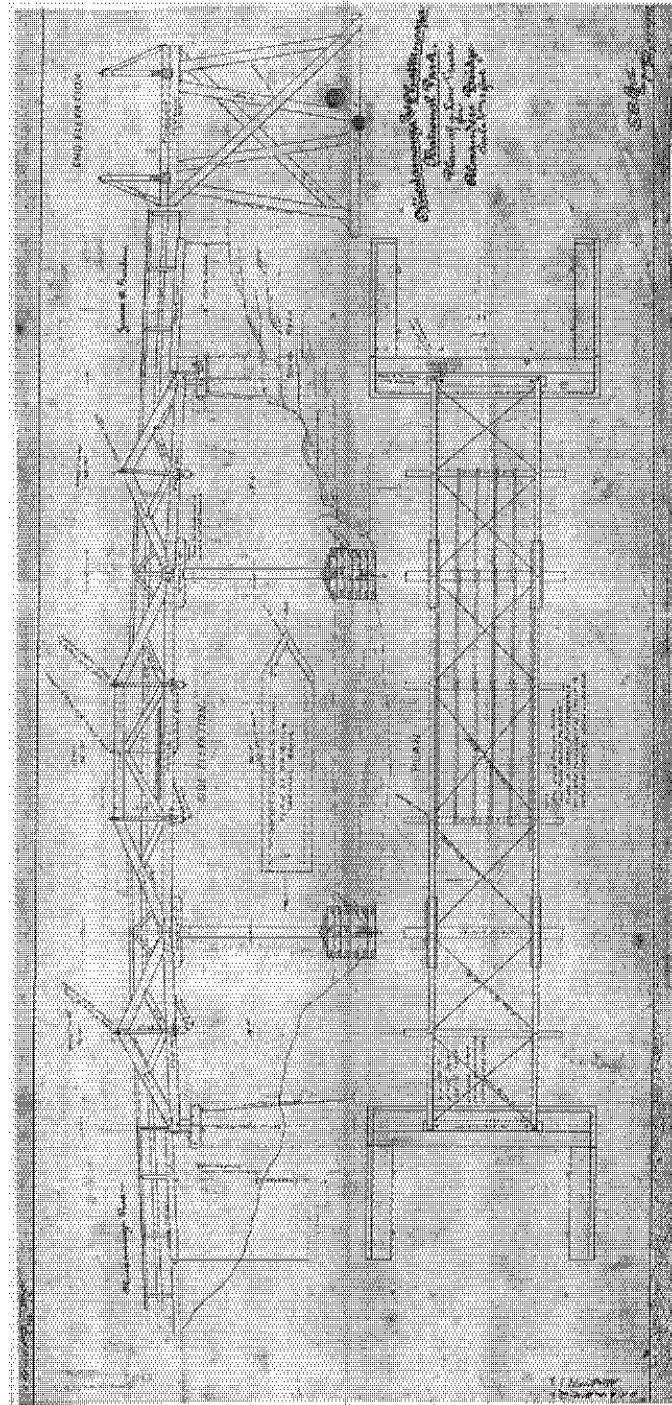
"Plan of a Low Truss for Alexander's Bridge," Edward E. Betts, July 27, 1897 showing first park-era wooden bridge and stone abutments still in use today.
